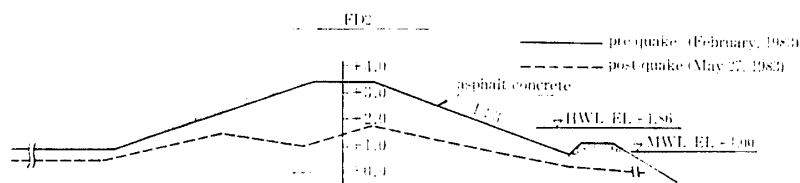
Cross-section of a damaged embankment section of a frontal dike in Hachirogata Lagoon (Ref. [4]).
